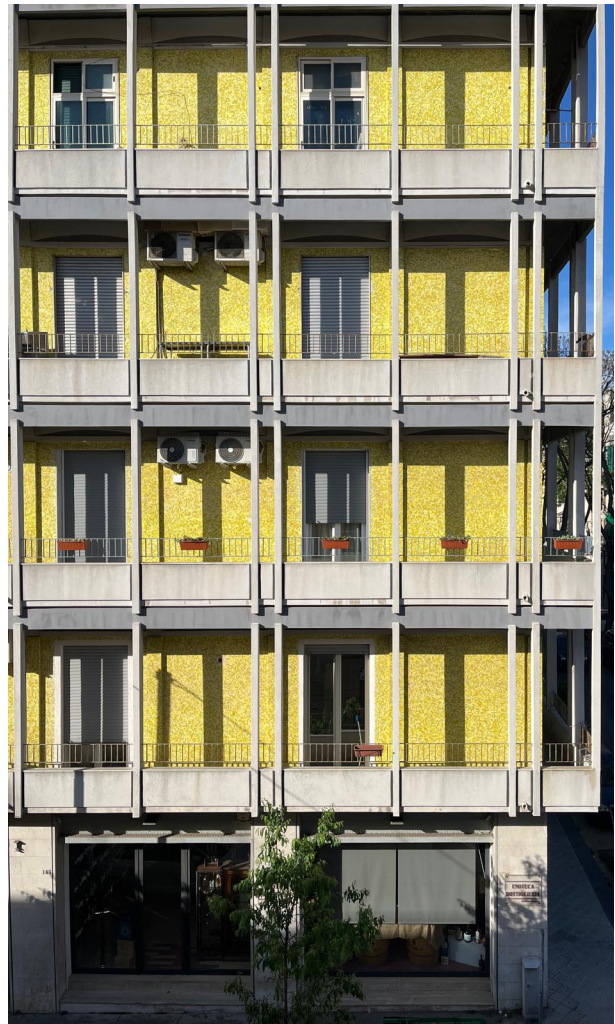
Buildings with facades defined by structural elements external to the facade (photos by the author).
